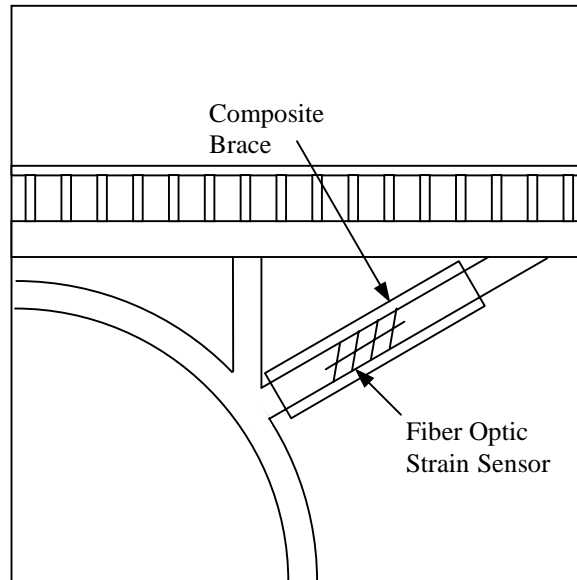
Strain sensor monitoring truss reinforced with composite brace
